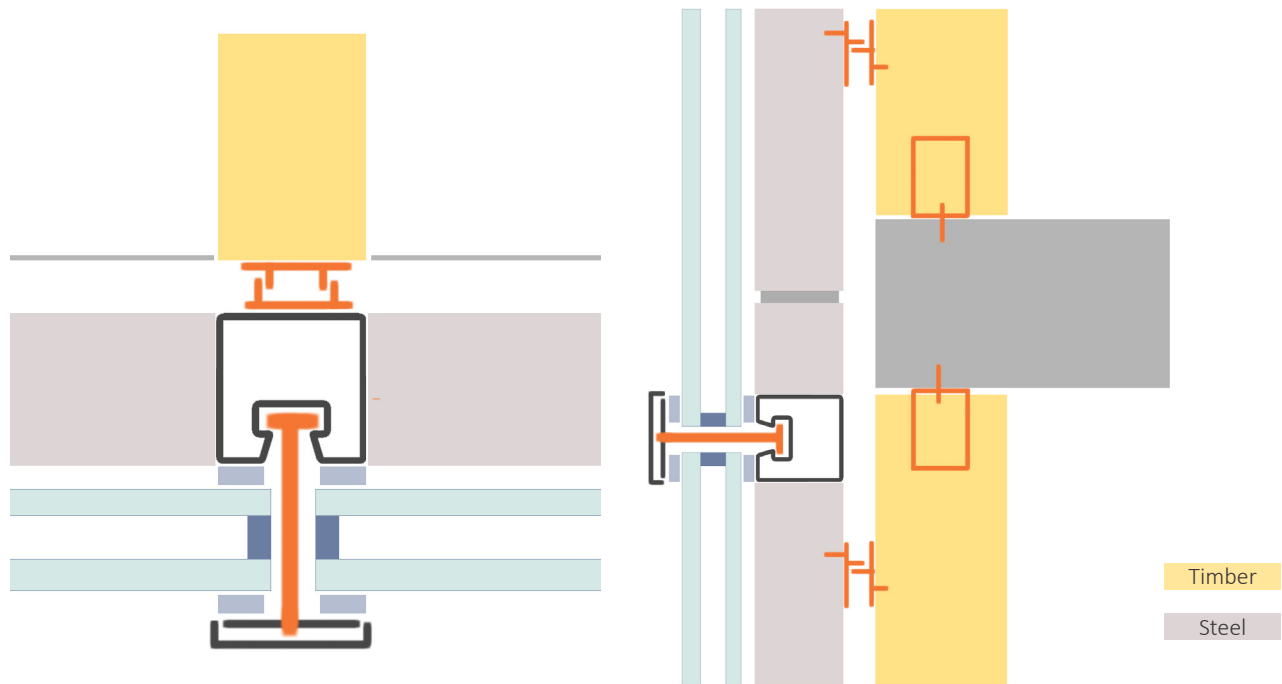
Design ideas for strengthening and fixing the mullion with timber substructure in (left) plan, and (right) section (source: author)
